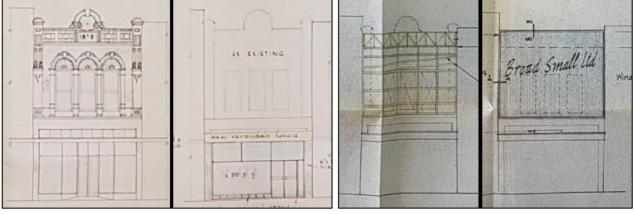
Details from 1960 plan of premises at 26 Tay Street, showing the alterations to the shop's street façade (Smith, Rice, & Lawrence, 1960).
